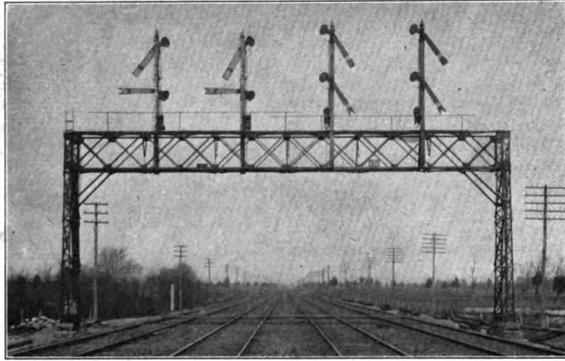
New York Division Pennsylvania Railroad, Near Bristol, Looking East; Signal Bridge No. 436.
